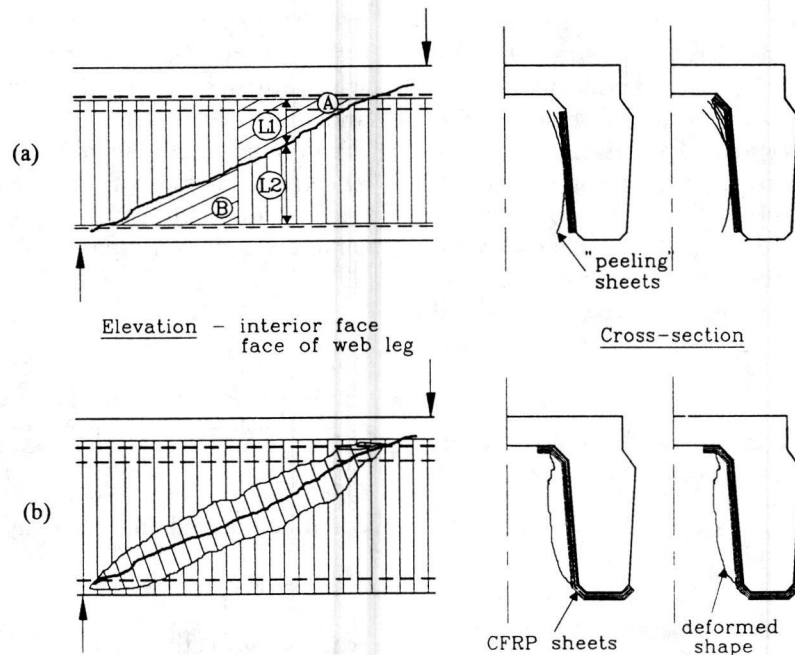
Progression of failure of cracked section with bonded CFRP sheets.
